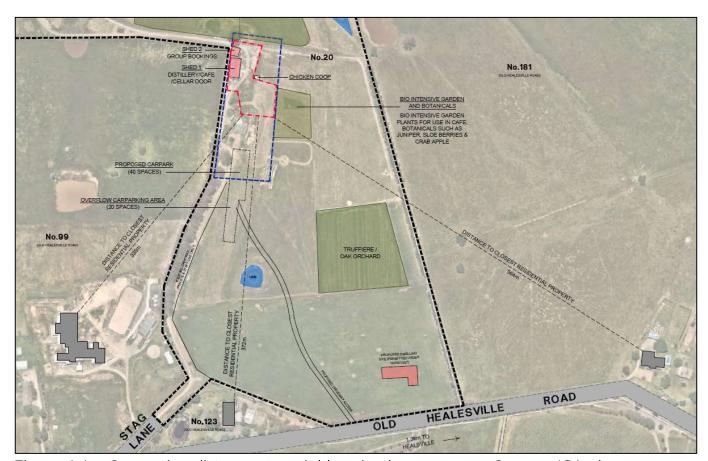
Separation distances to neighbouring houses Source: JCA plans
